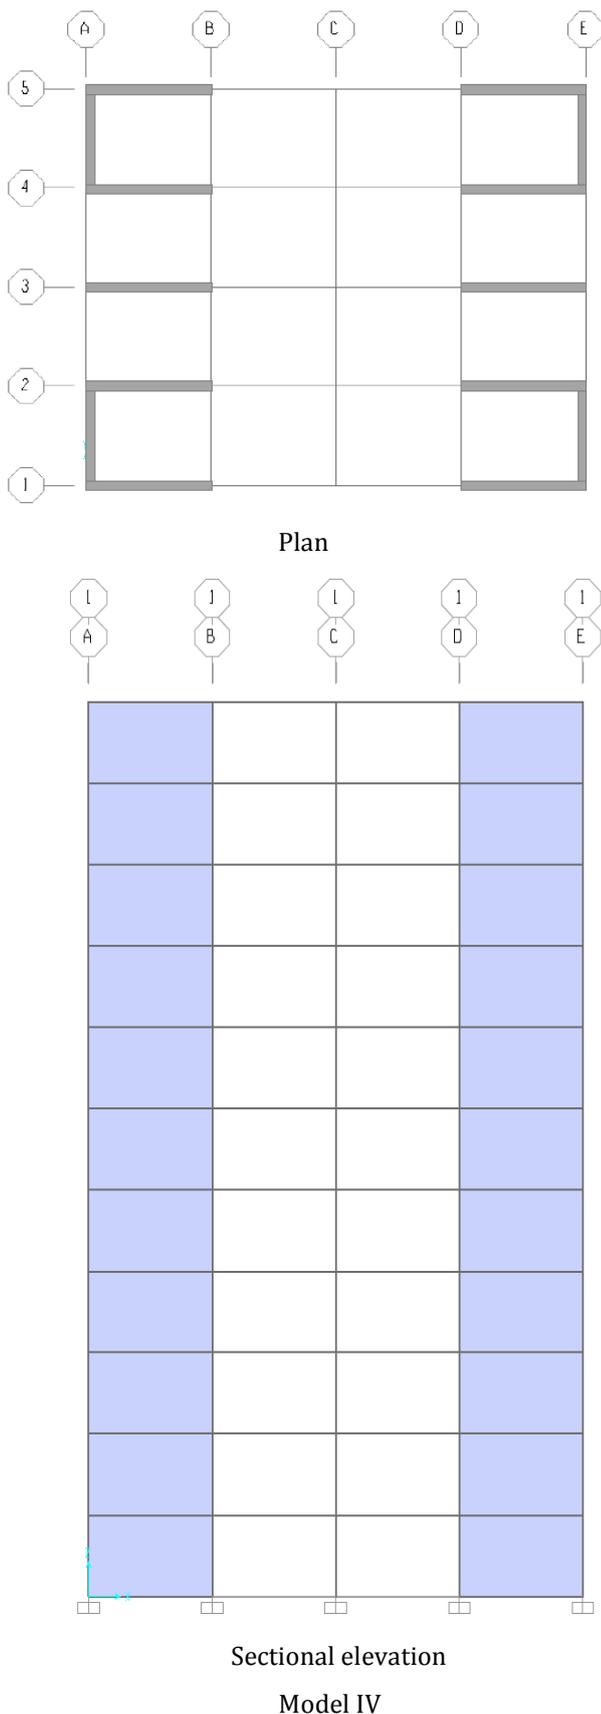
Plan and Elevation of Eleven Storeys Reinforced Concrete Buildings
